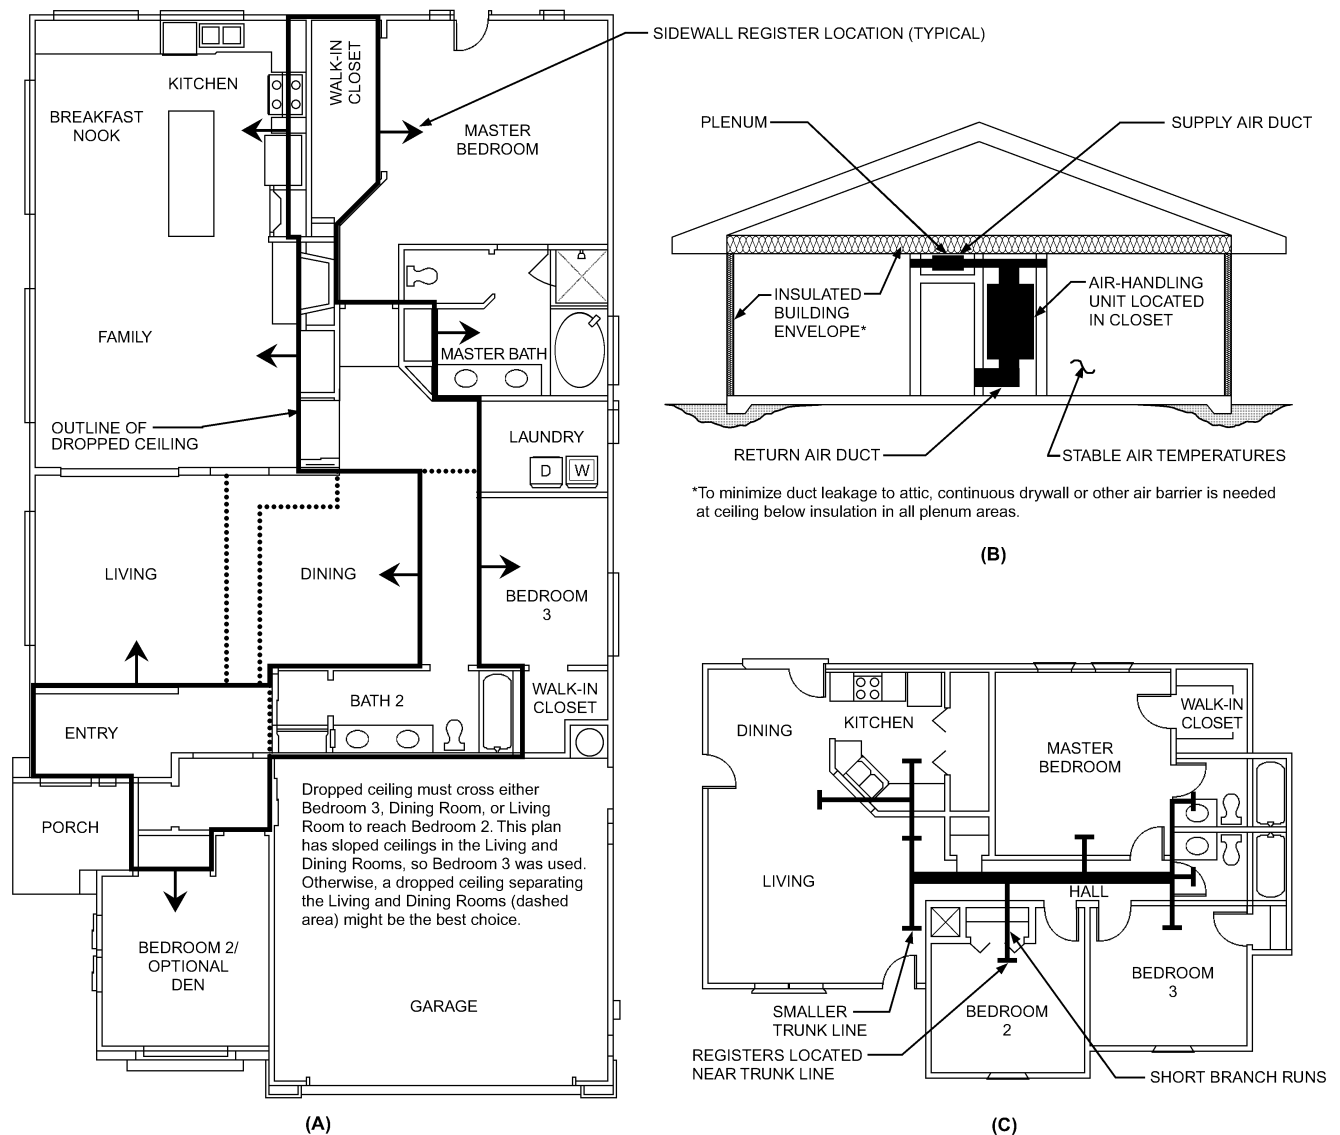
Sample Floor Plans for One-Story House with (A) Dropped Ceilings, (B) Ducts in Conditioned Spaces, and (C) Right-Sized Air Distribution in Conditioned Spaces
